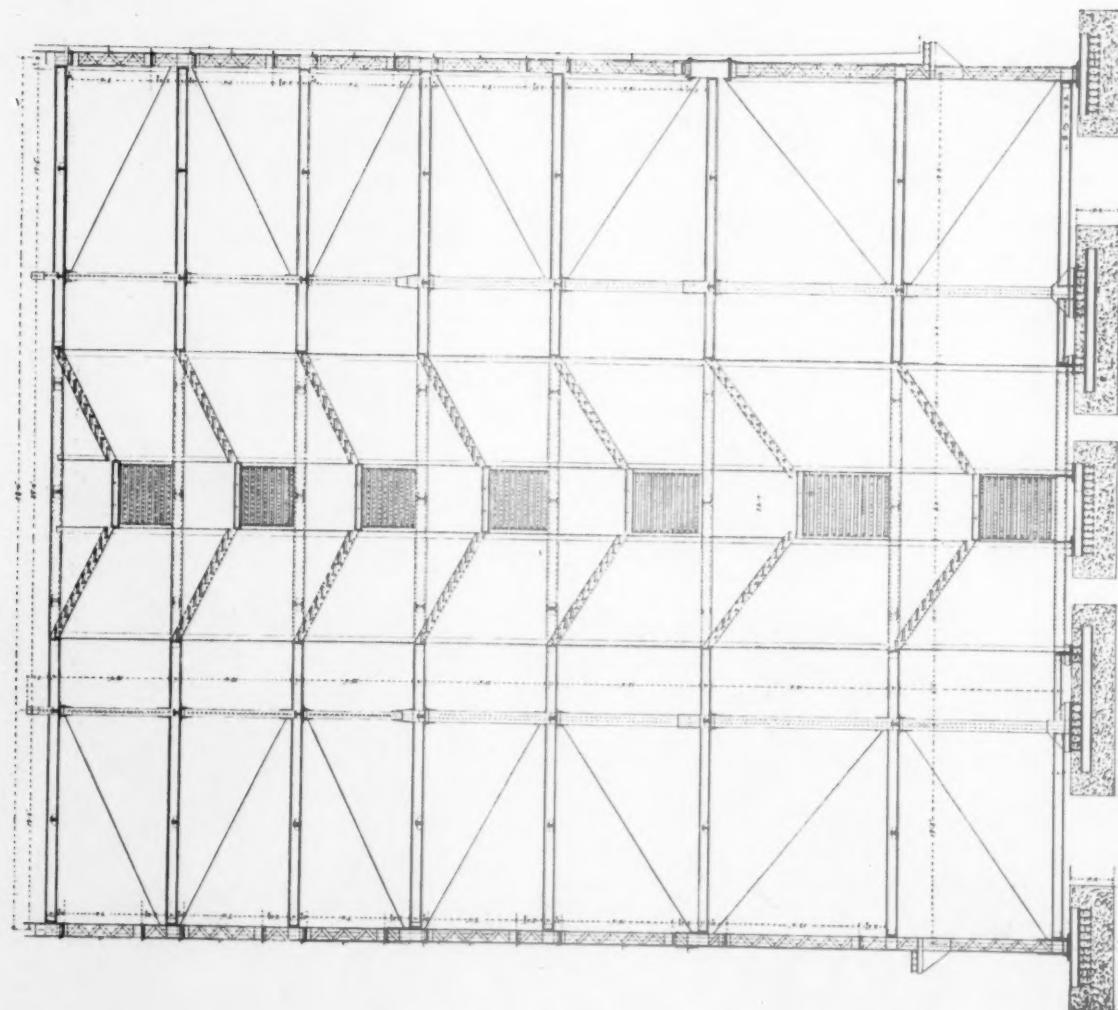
Section of Six Floors for Twenty-Eight-Story Building,
